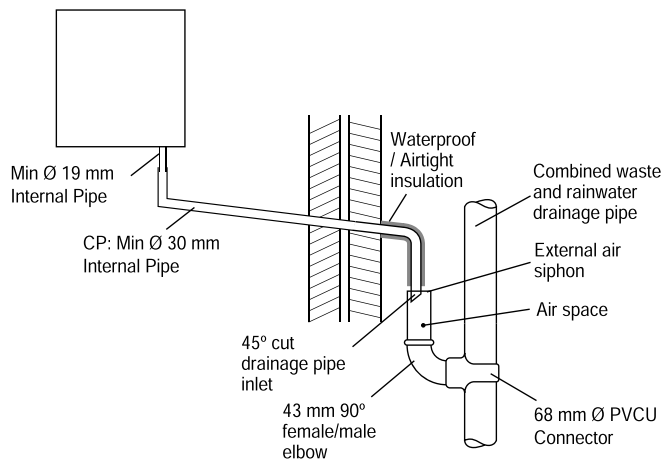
Connection of Condensing Drainage Pipe to External Rain Water Drainage from outlet of Sink, Bathtub or Shower Waste Water
